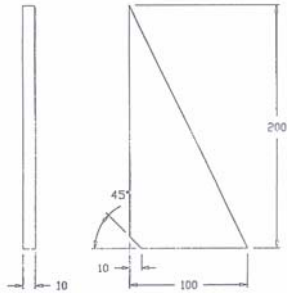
K-bracing and shear-link: detail of Pos. 16
